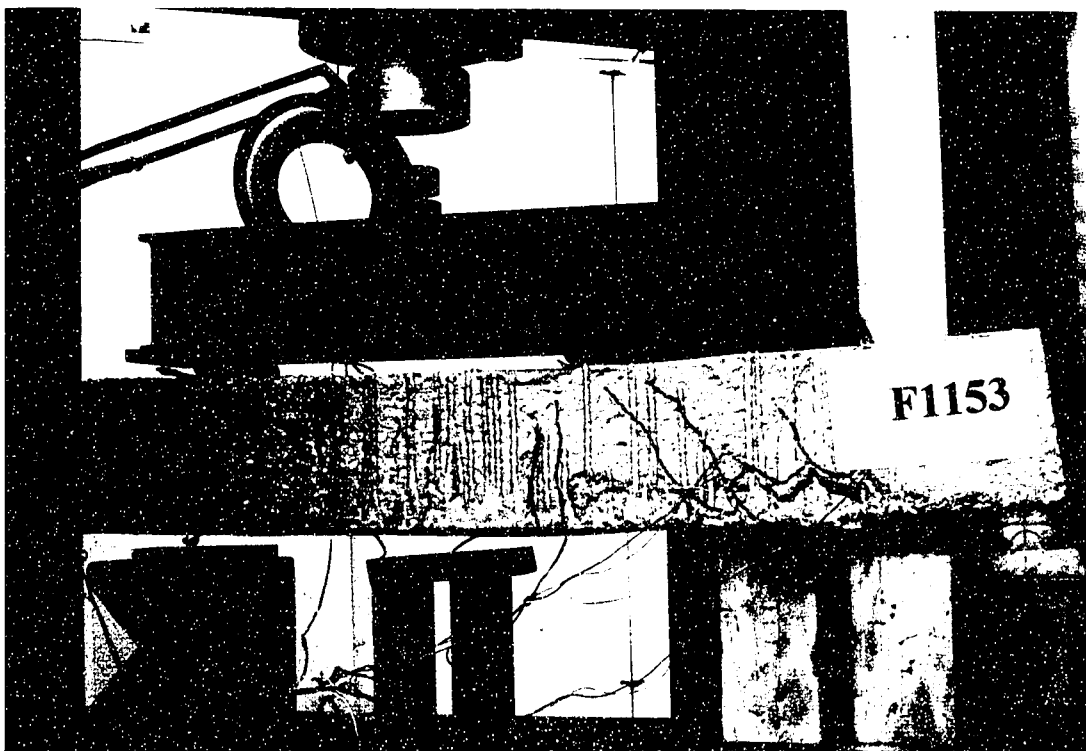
Photograph showing the mode of failure for beam F1153 strengthened by 1 mm thick, 100 mm wide and 900 mm long plate with 30 mm c/c spacing of stirrups
